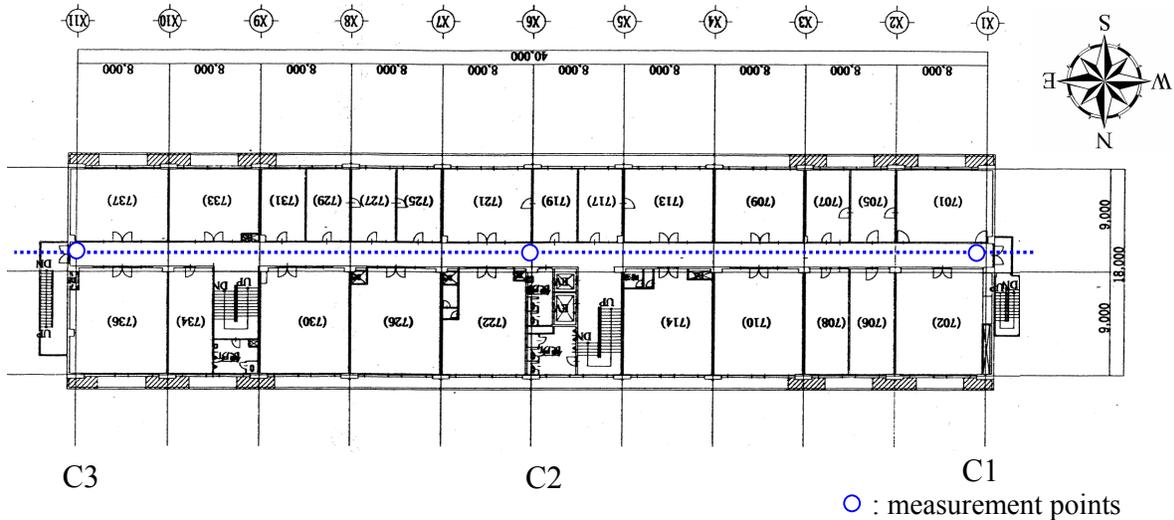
Plan of 7th floor and measurement points for ambient vibration test (below: north)
